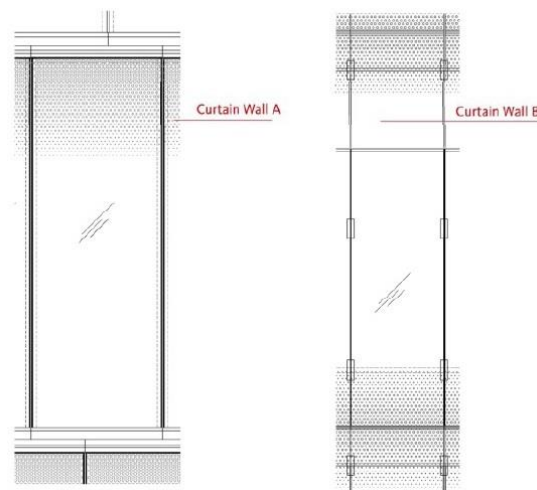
Curtain wall A & B standard panels (Shanghai Tower Façade Design Process, 2010)
